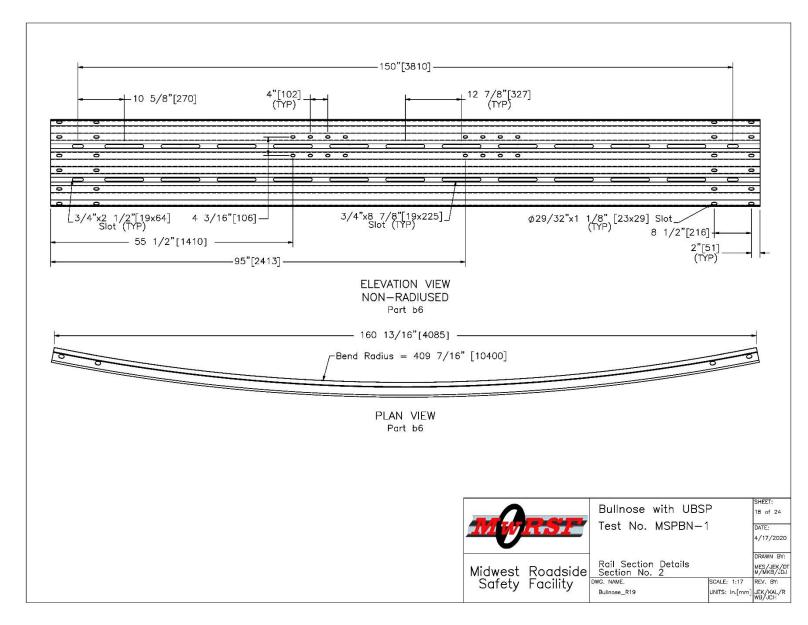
Rail Section Details Section No. 2, Test Nos. MSPBN-1 through MSPBN-3
